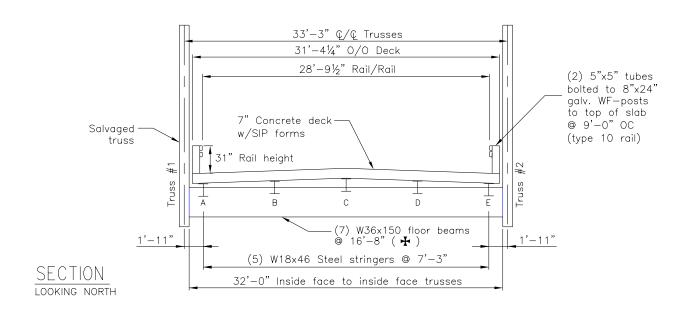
Structure Component Naming Convention for Trusses
